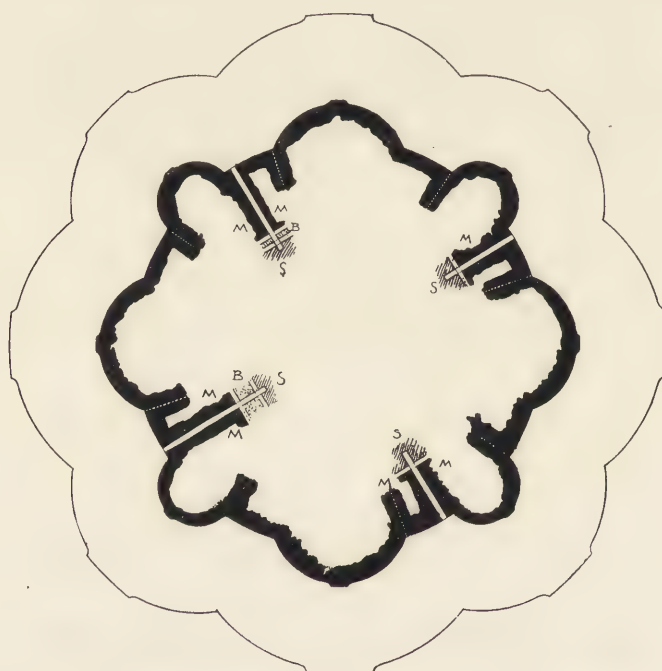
HORIZONTAL SECTION OF A MINOR PILLAR OF THE NAVE.
